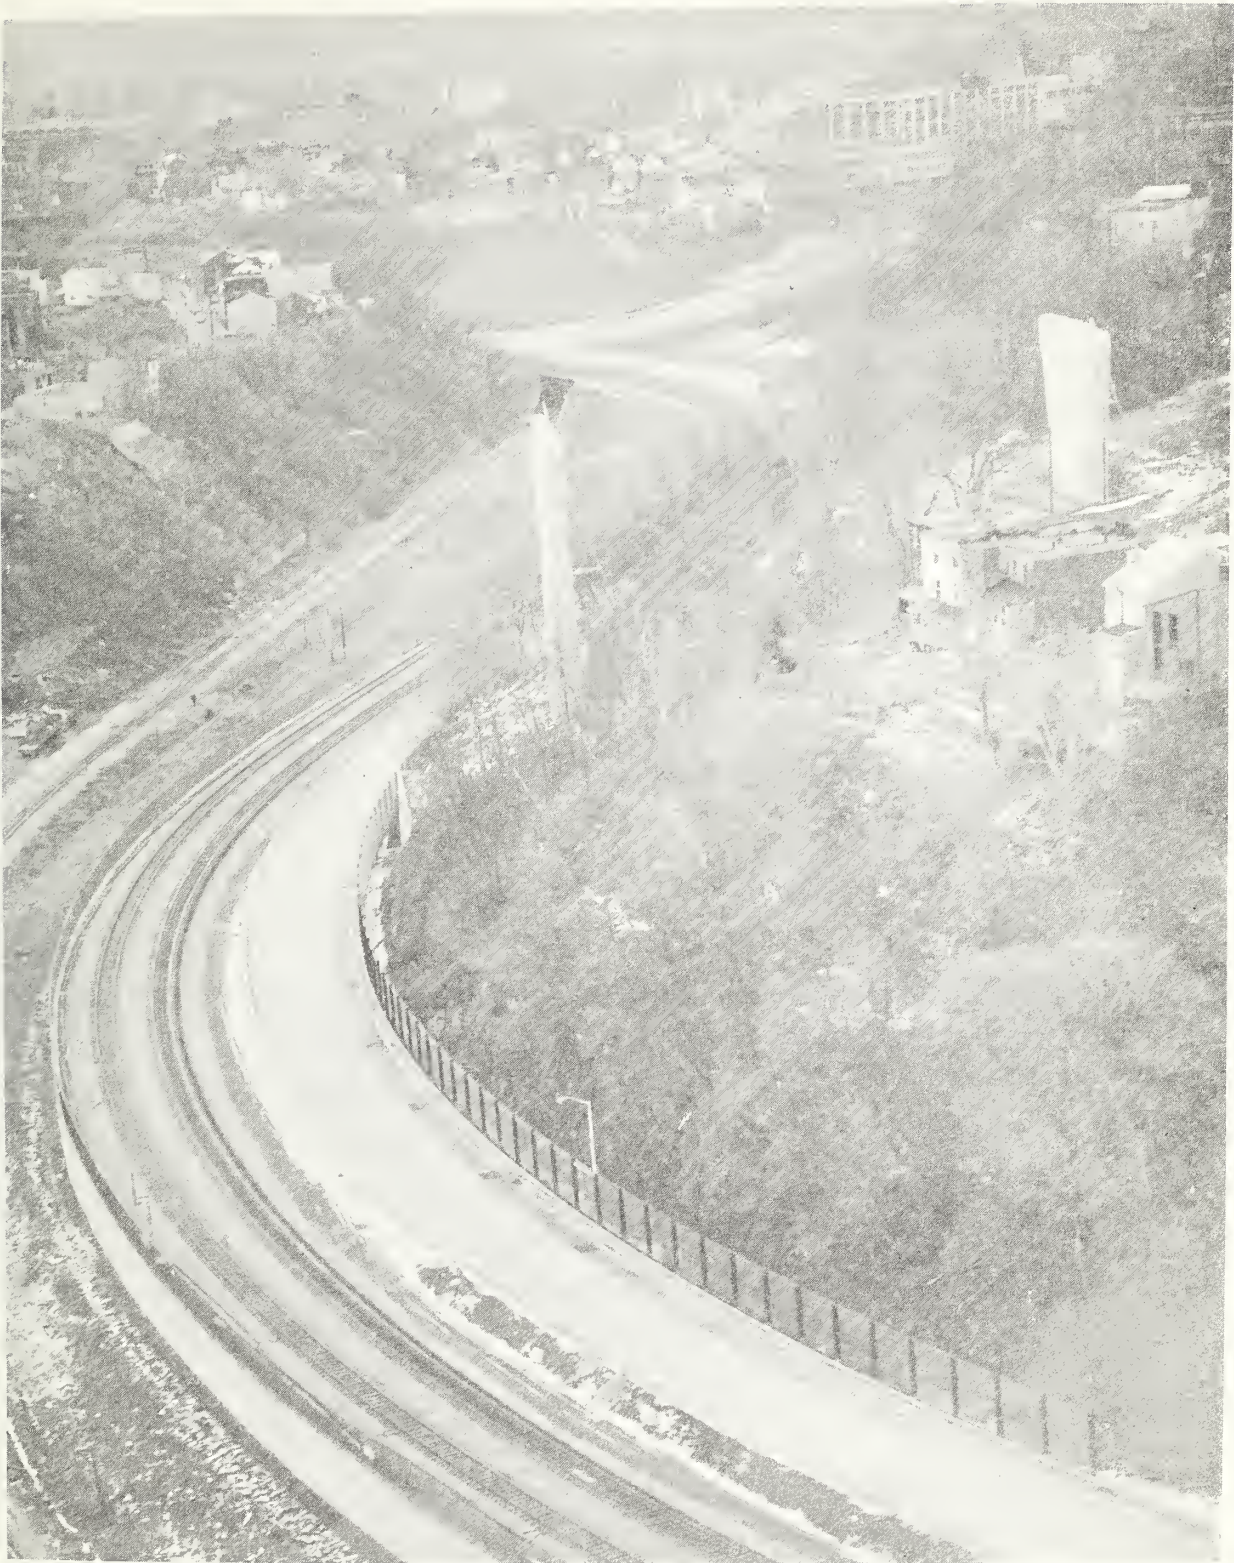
THE BUSWAY UNDER CONSTRUCTION
